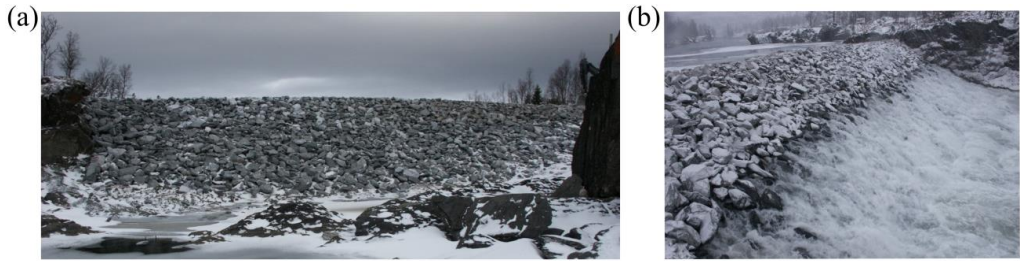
(a) Image of the test rockfill embankment (M1) from the test site at Rossvatn, Norway prior to testing; (b) Image of the test dam during testing (Image courtesy: EBL Kompetanse (2006)).
